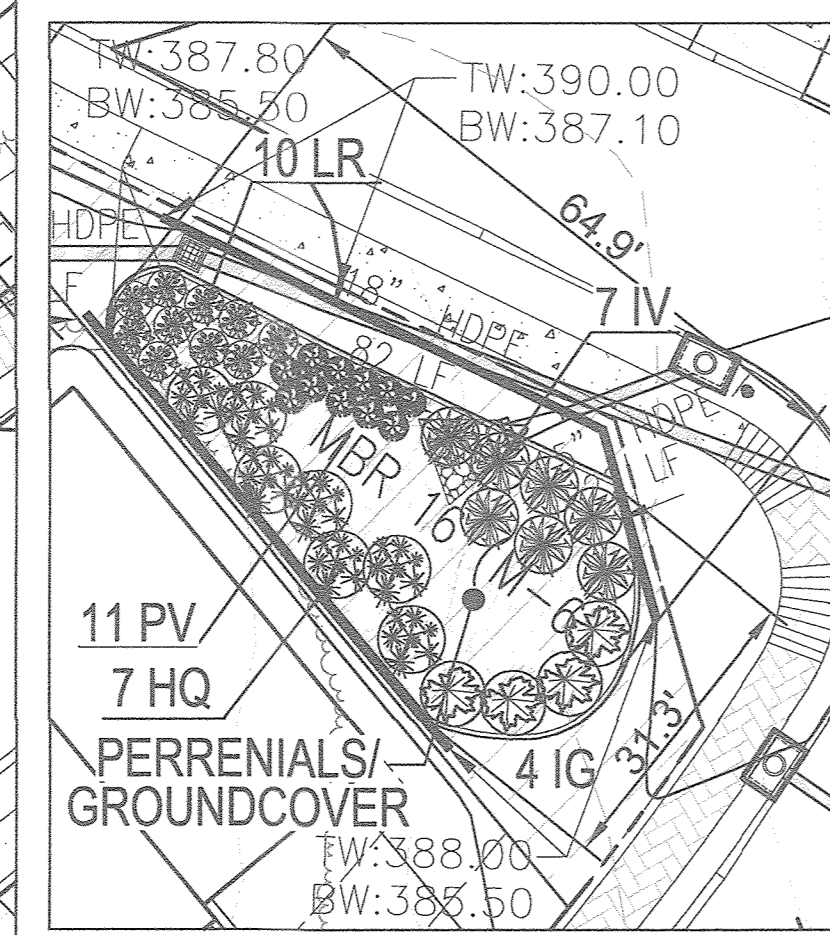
DETAILED BIO AND PLANTING PLAN (SWM #13)
